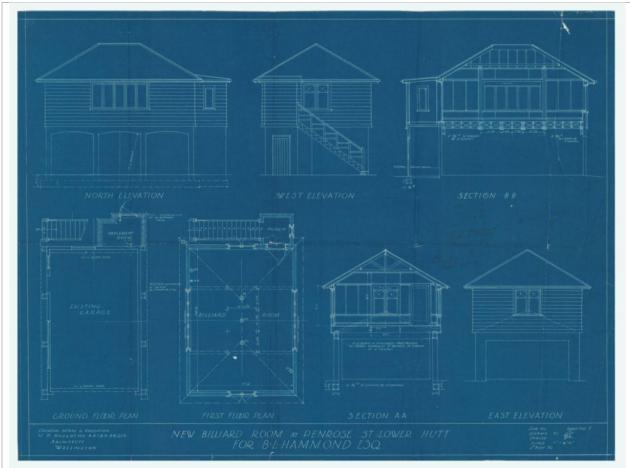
Billiard Room extension drawings, 1932. Source: HCC Archives
